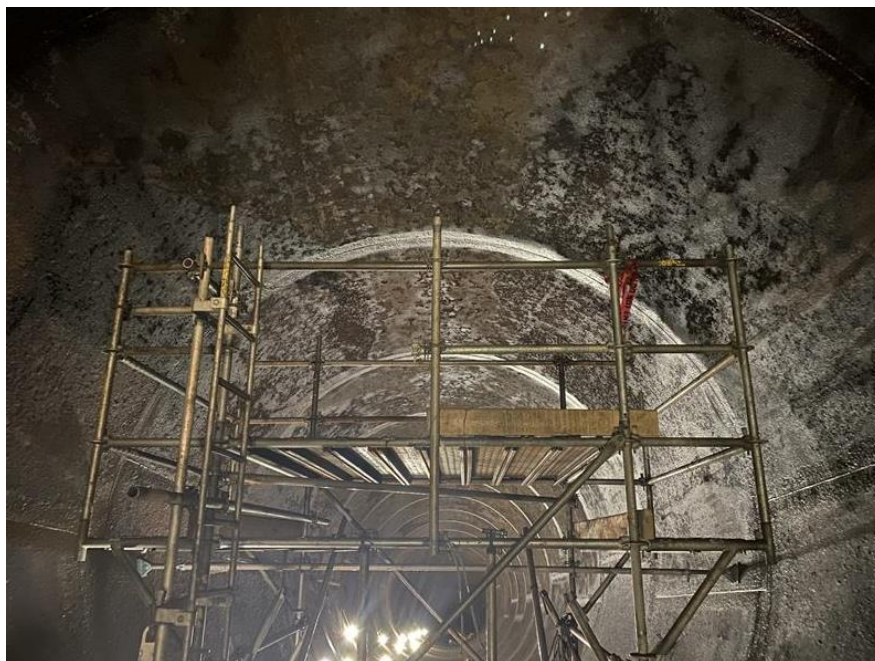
Typical Scaffold Set Up – Refurbishment Section
